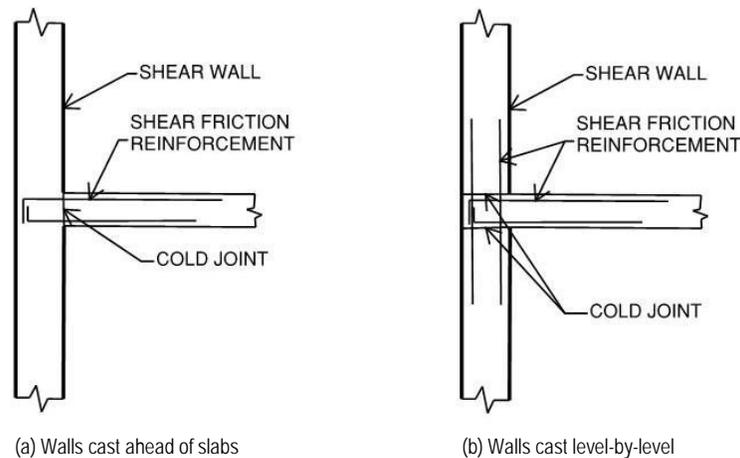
Common cast-in-place concrete wall to slab connections
